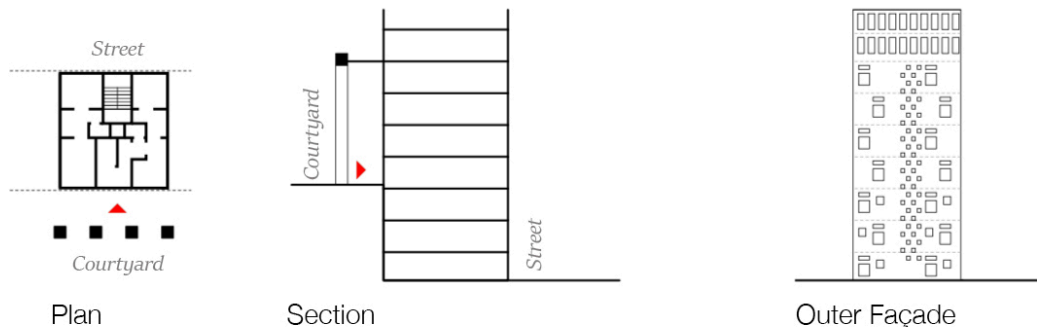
Plan, section and exterior elevation of a block with entrance from the courtyard level.
